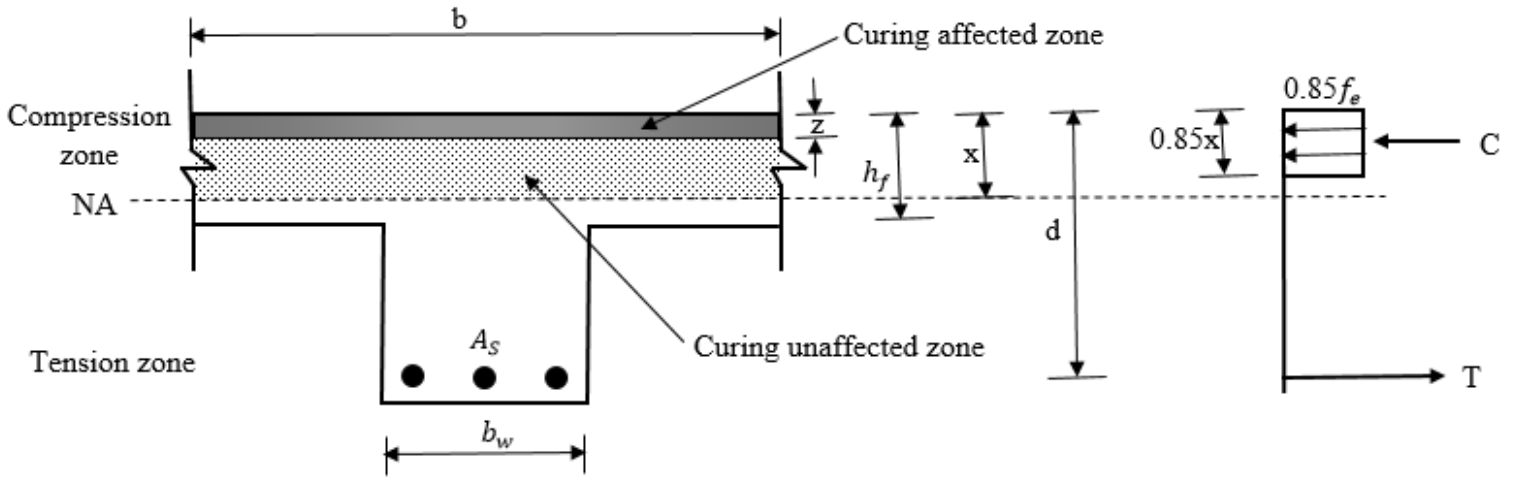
Cross-sectional view of T-section singly reinforced beam (NA within flange)
